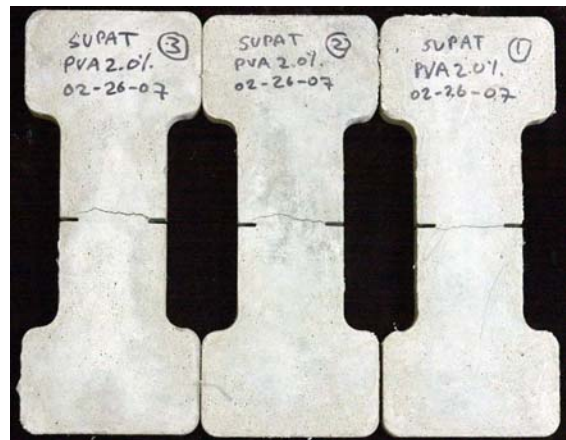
(b): Photo of tested specimens reinforced with 2% PVA fiber
